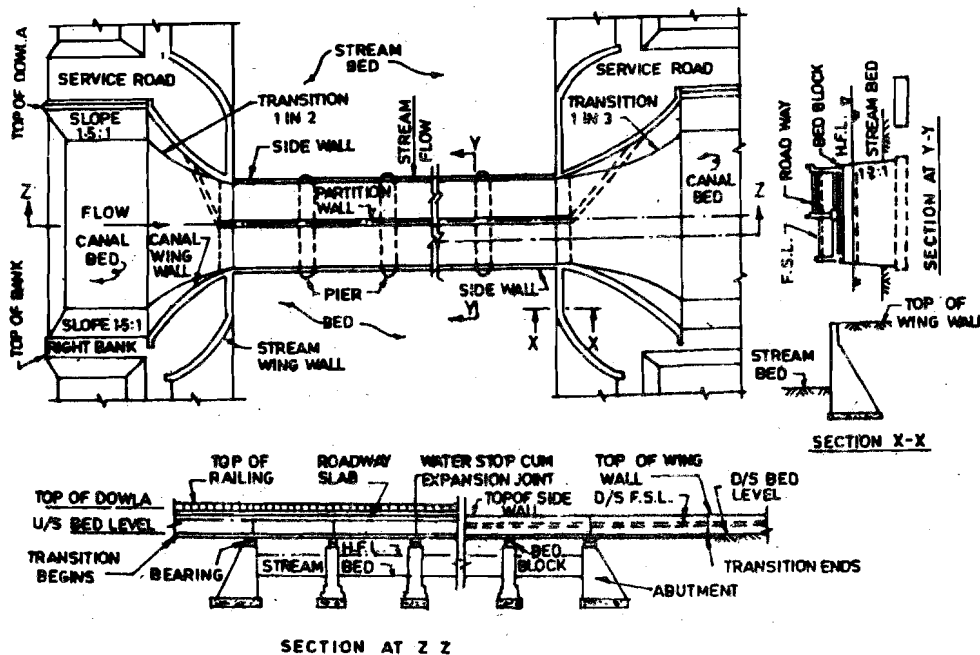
Typical Plan and Section of an Aqueduct (Type III)
